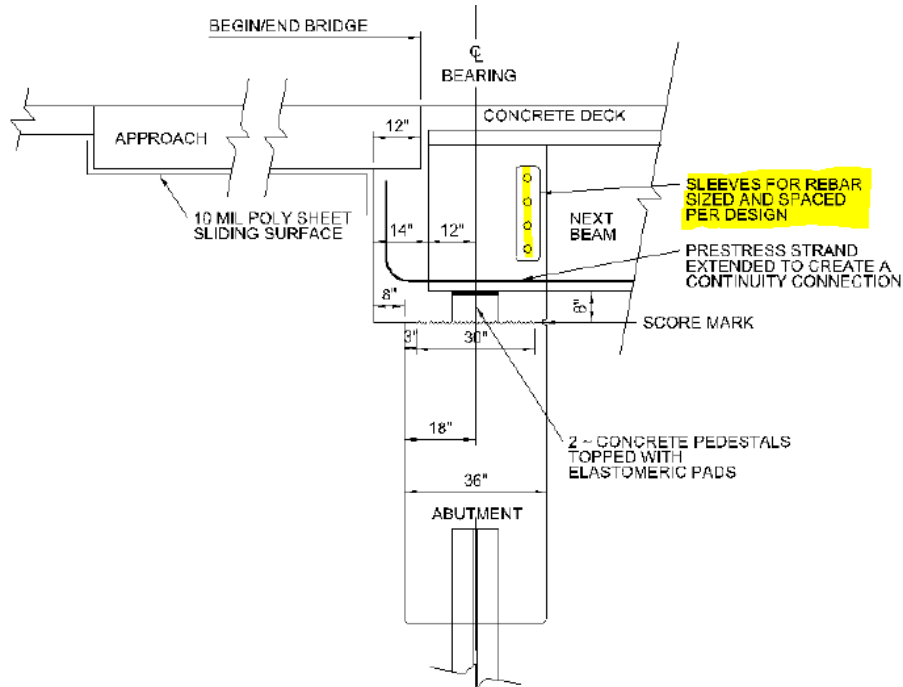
3 North East Extreme Tee (NEXT) Type A Bridge End Detail
